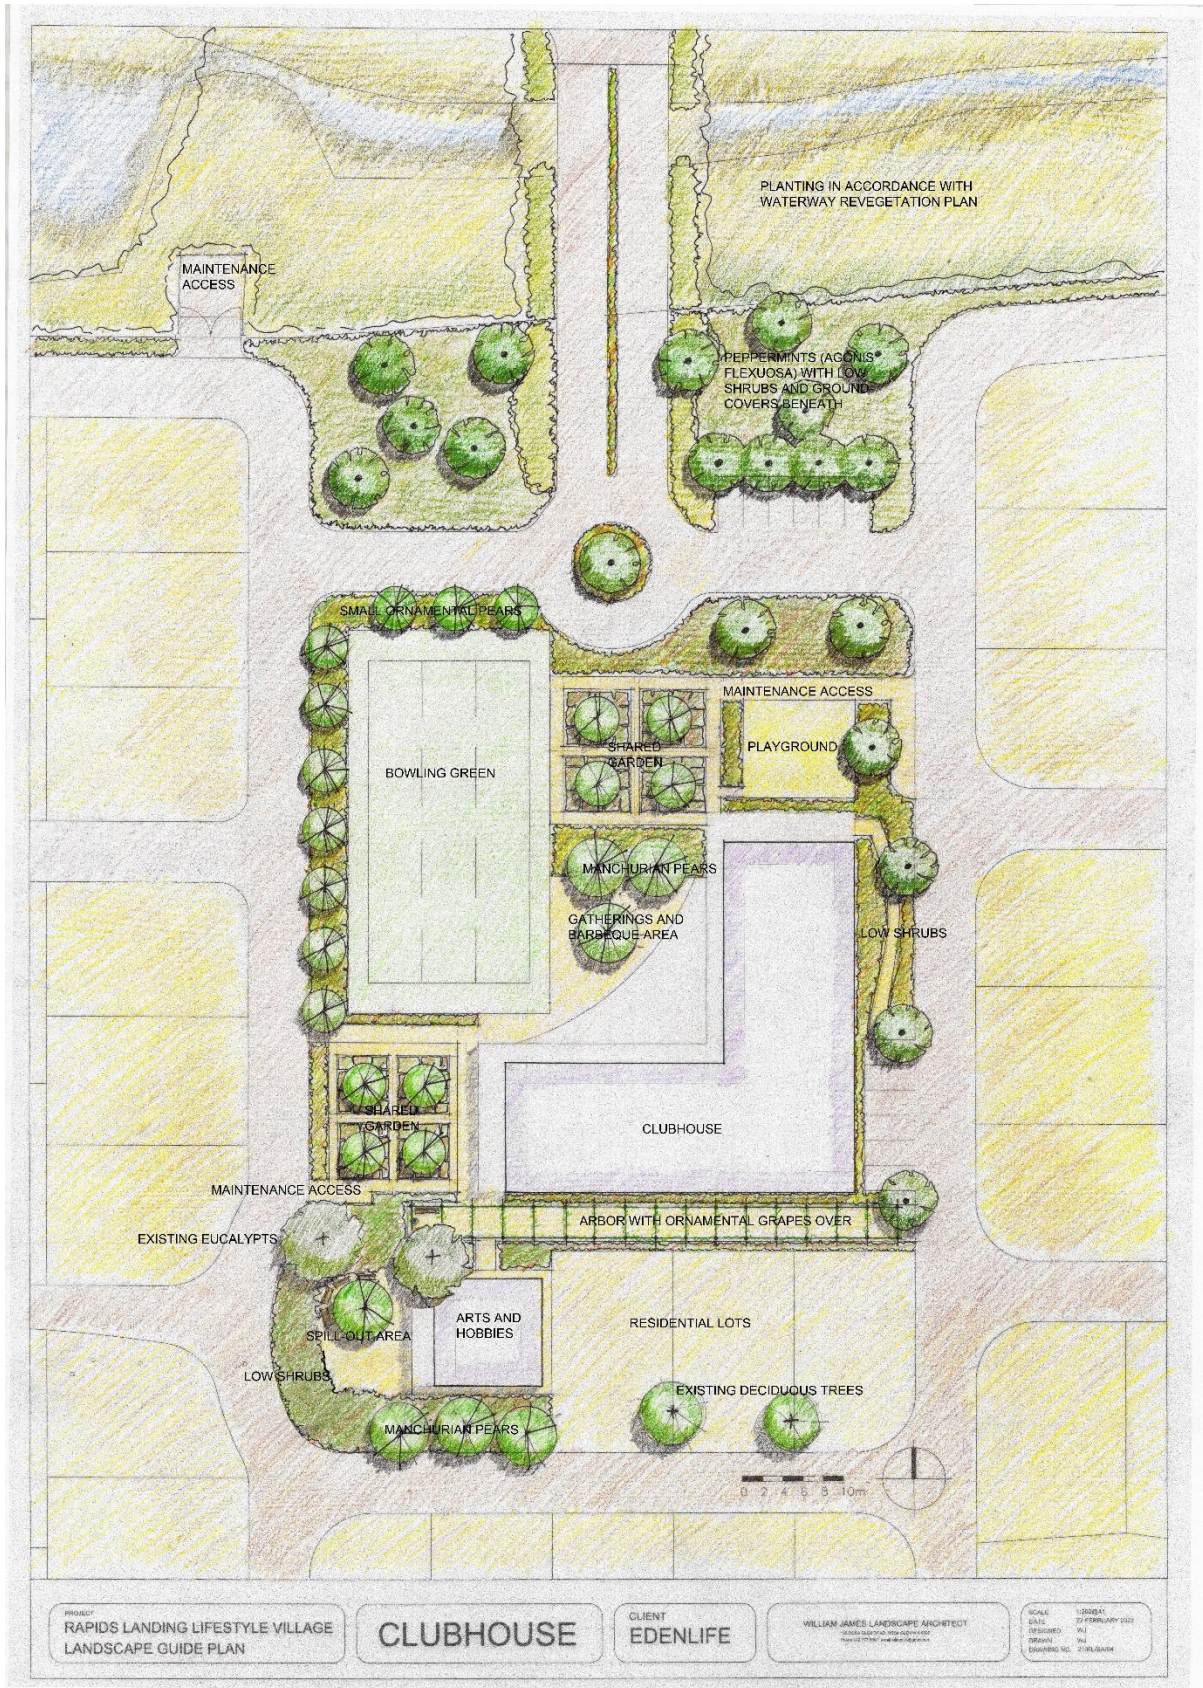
CLUBHOUSE LANDSCAPE GUIDE PLAN
